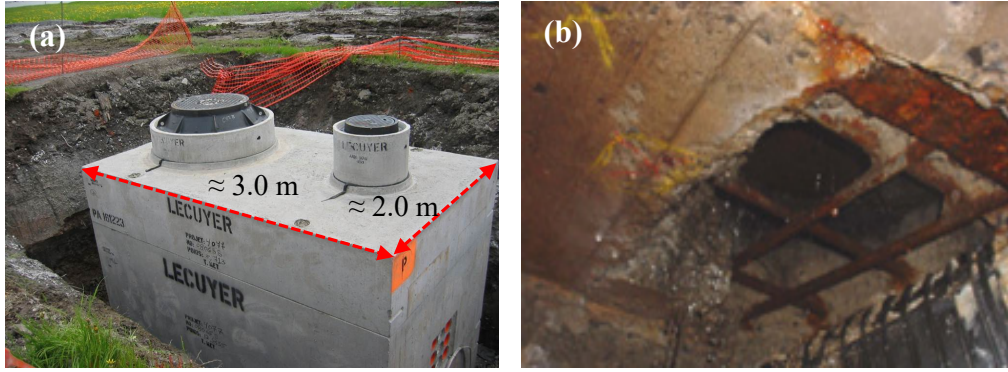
a: Picture showing a typical underground concrete structure. b: Picture of the concrete slab forming the roof of the structure. The picture was taken from the interior of the structure
